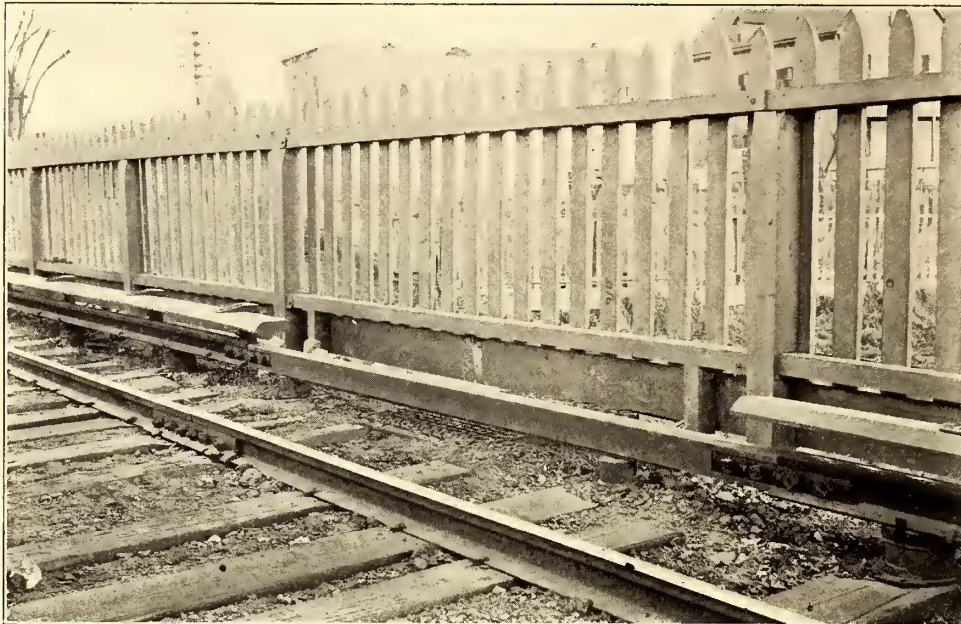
10-FT. BREAK IN THIRD RAIL OVER MANHOLE COVERS ON ATLANTIC AVENUE
